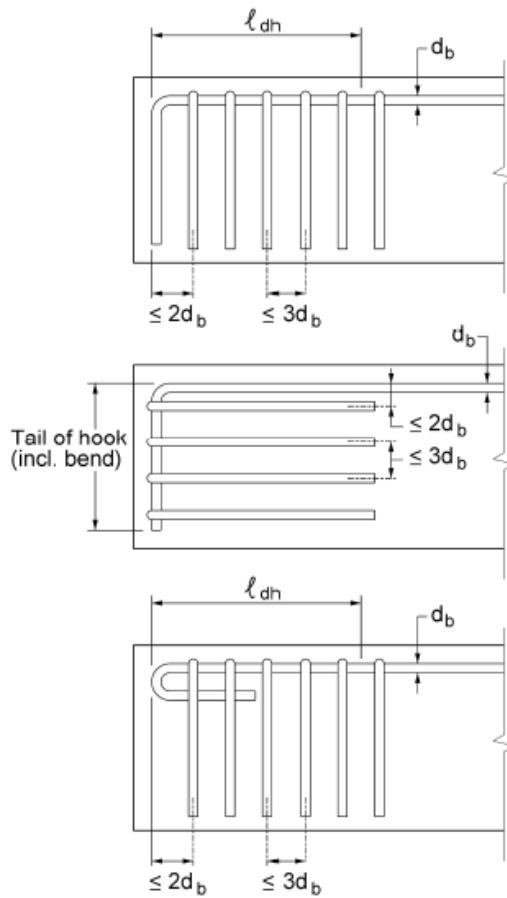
1—Confinement of Hooked Bars by Stirrups
